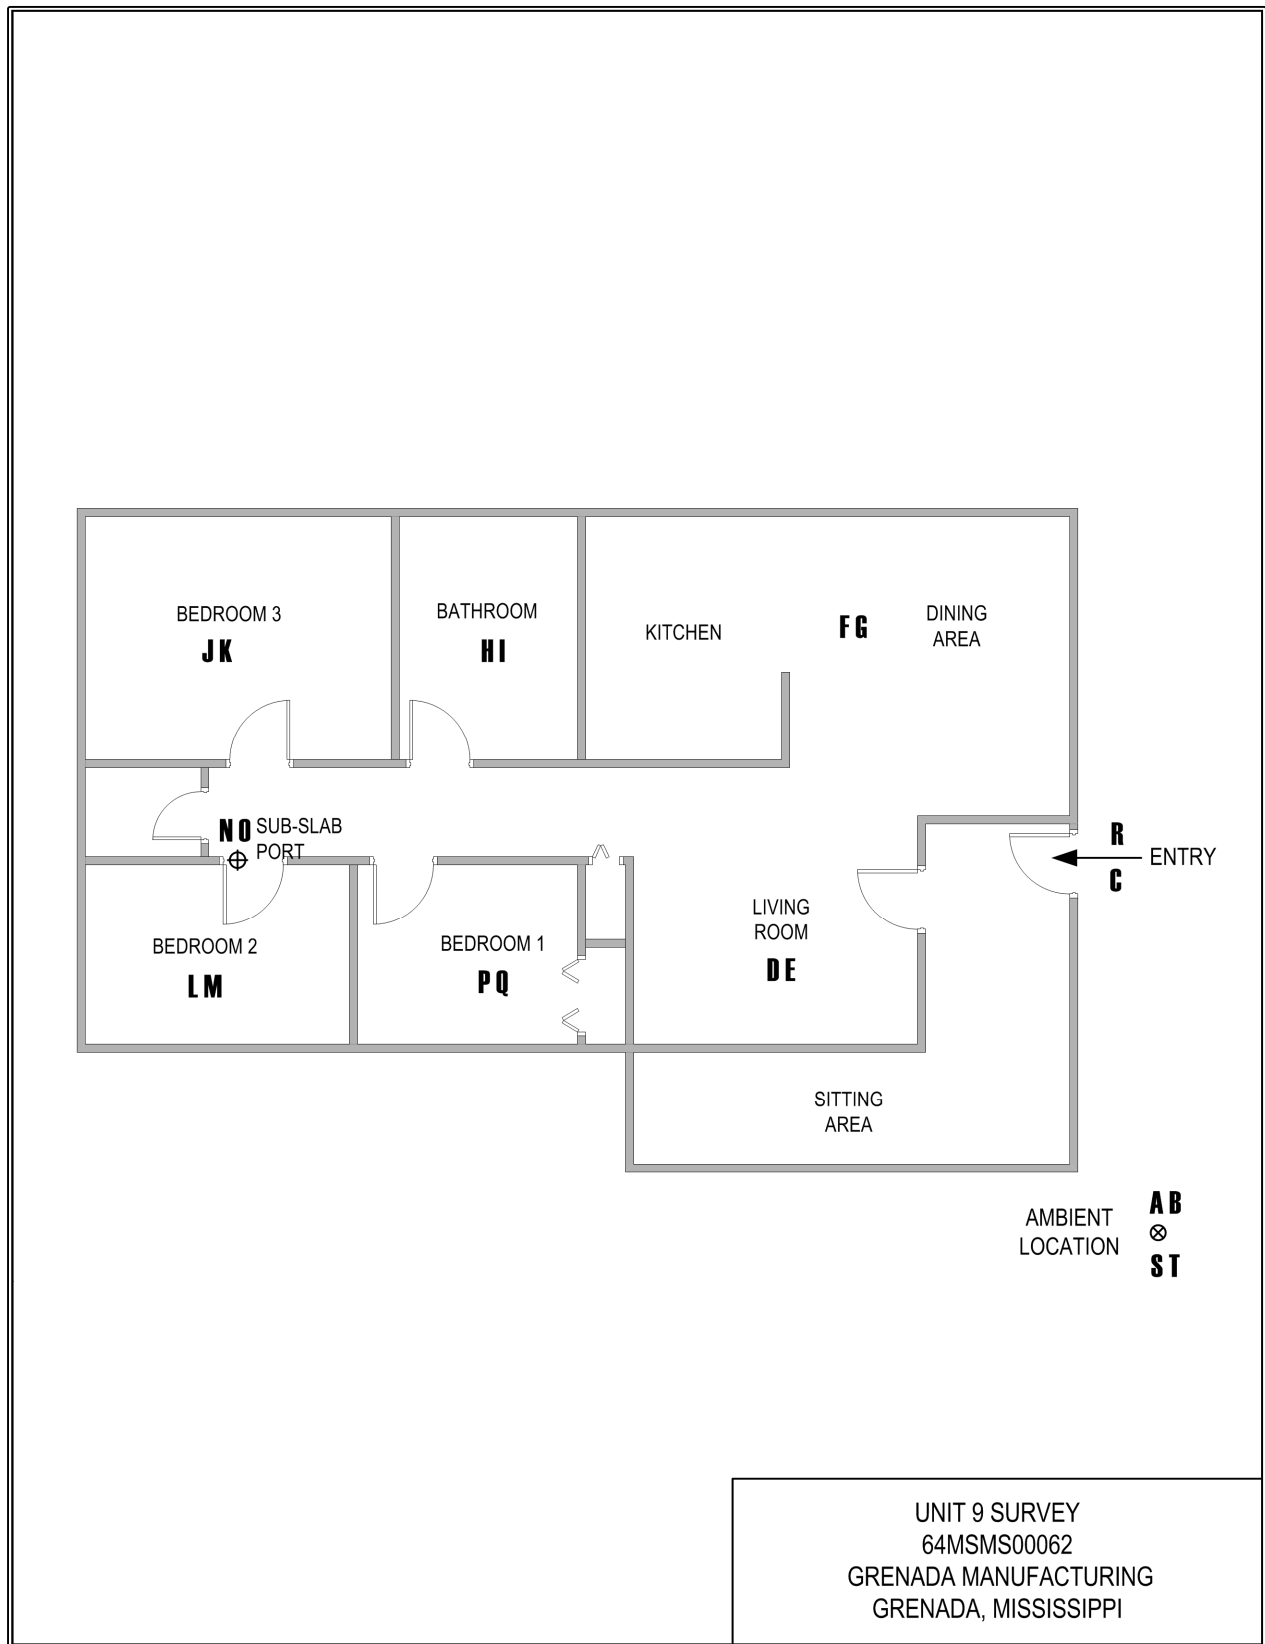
Unit 9 Survey Floor Plan, 64MSMS00062
